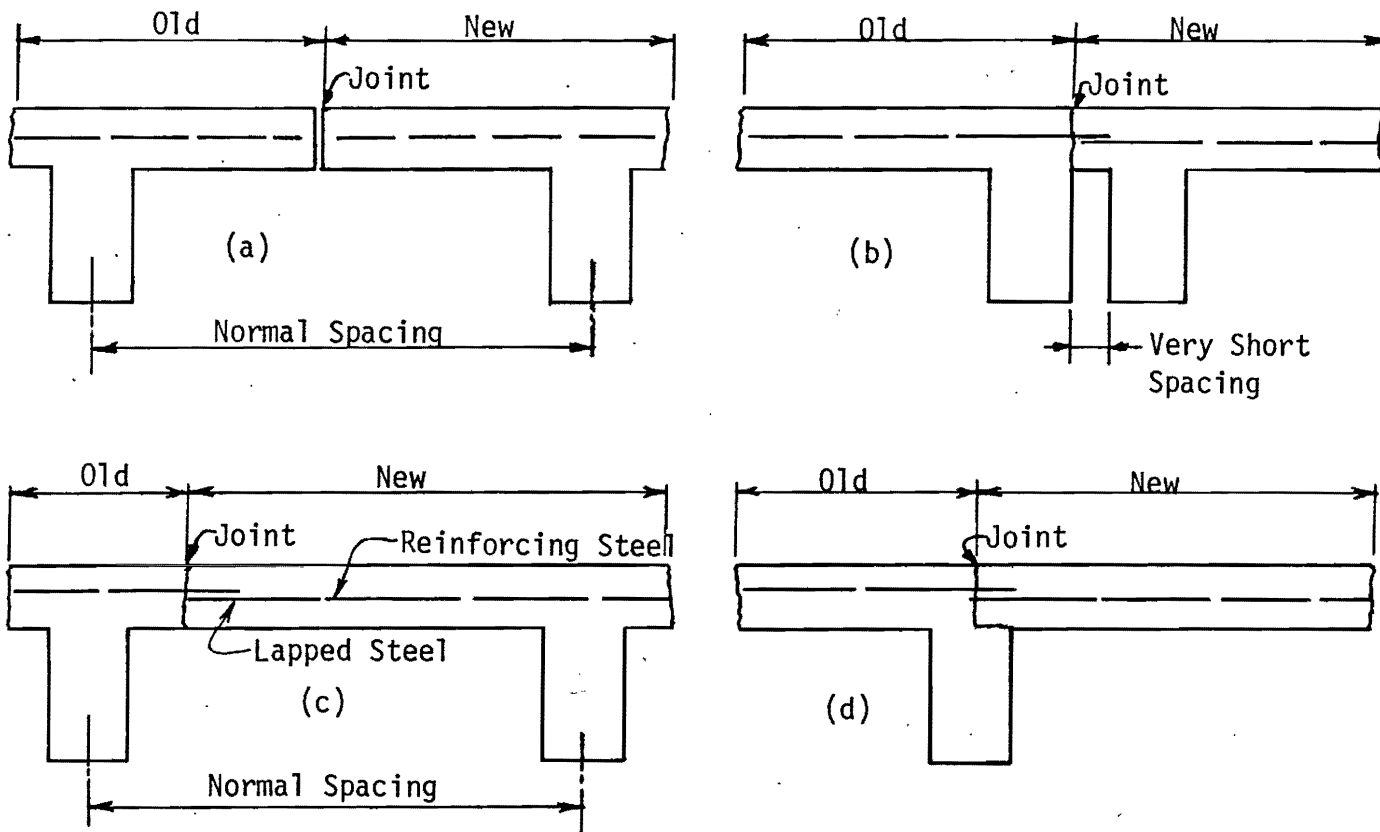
Types of Construction that Connect New Concrete to Existing Structure in Bridges Listed in Appendix A.
